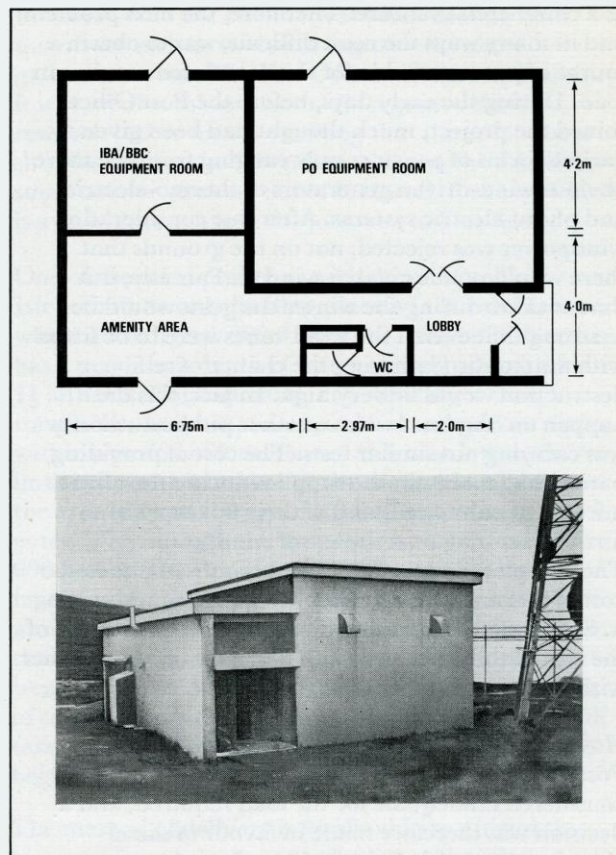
As part of the conversion, the area between the blast wall and the main building has been roofed over to form an apparatus room for IBA/BBC equipment, and an amenity area for common use. The original generator room has been allocated to the Post Office. The photograph shows the building shortly before the work was completed.
